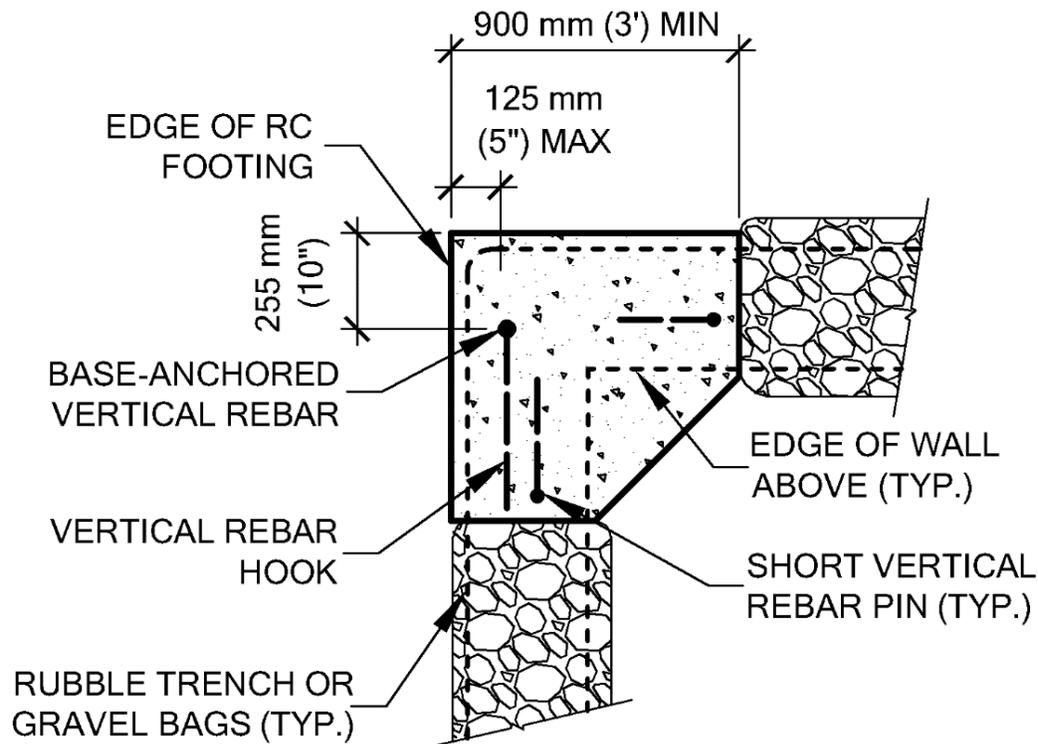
Spot footing to anchor short vertical rebar that will use an open splice.
